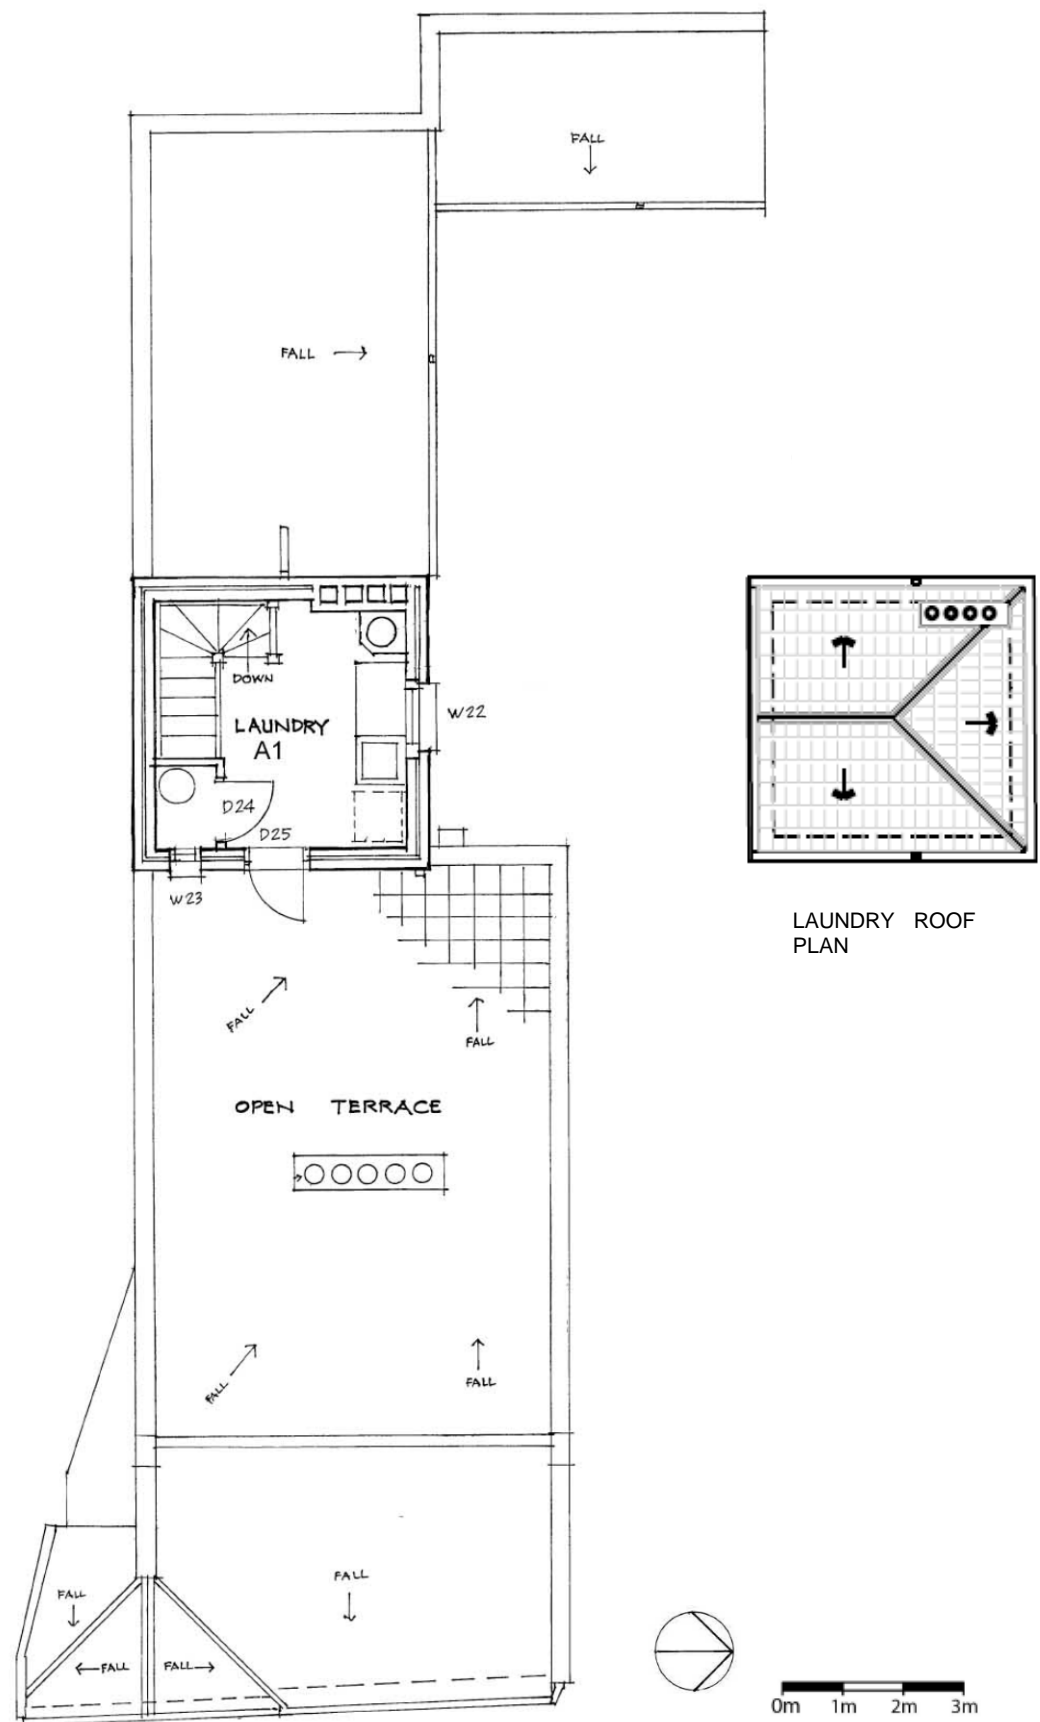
117-117A Gloucester Street – Third floor plan and laundry roof plan Source CLSP
